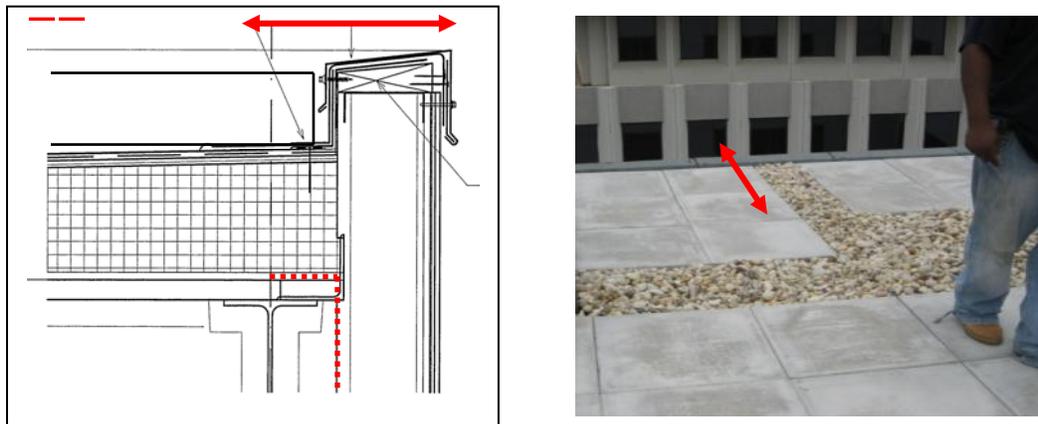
The Type B Zero height roof edge affords little protection with respect to wind forces. Air and thermal barrier continuity must be maintained. Rooftop users are placed at maximum personal risk along the roof edge.
